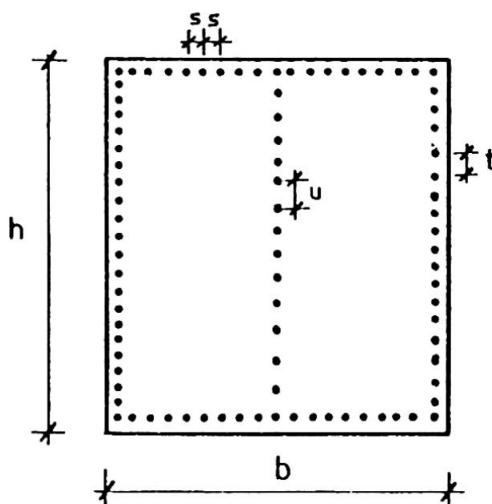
Definition of non-dimensional parameters n , m , and p for fastener spacing for a wall with three vertical studs.
